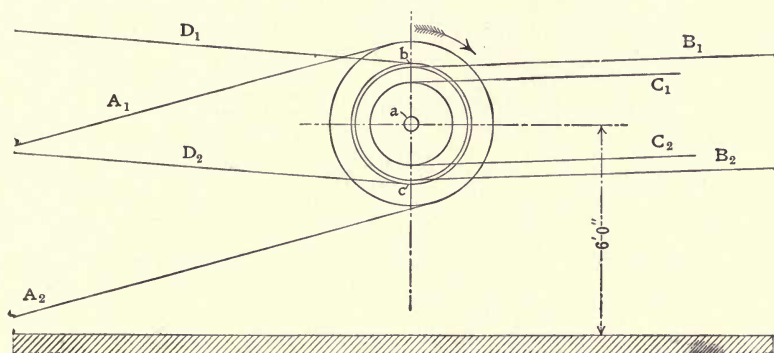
BELT PULL ON SHAFT-SUPPORTING PIERS.
